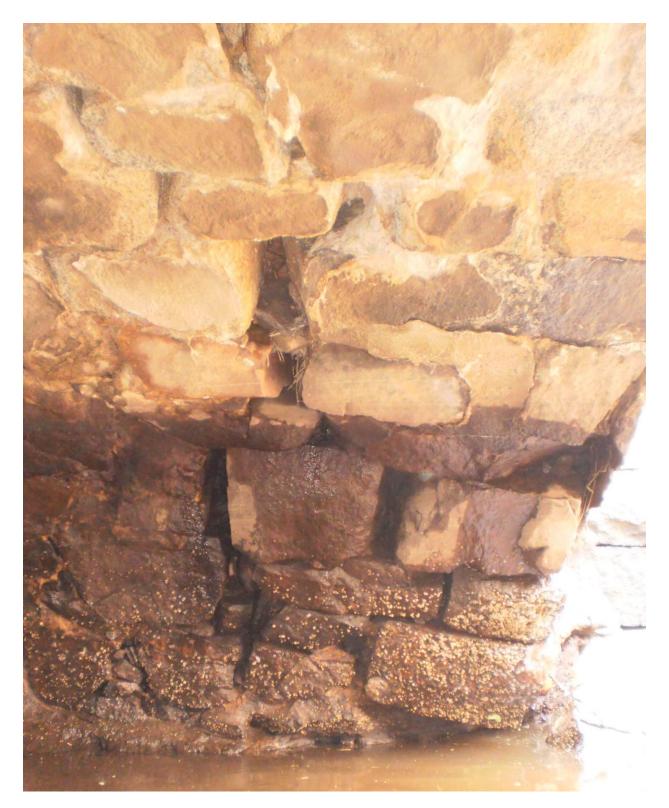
Separation and settlement of culvert arch stones, upstream, northwestern corner
